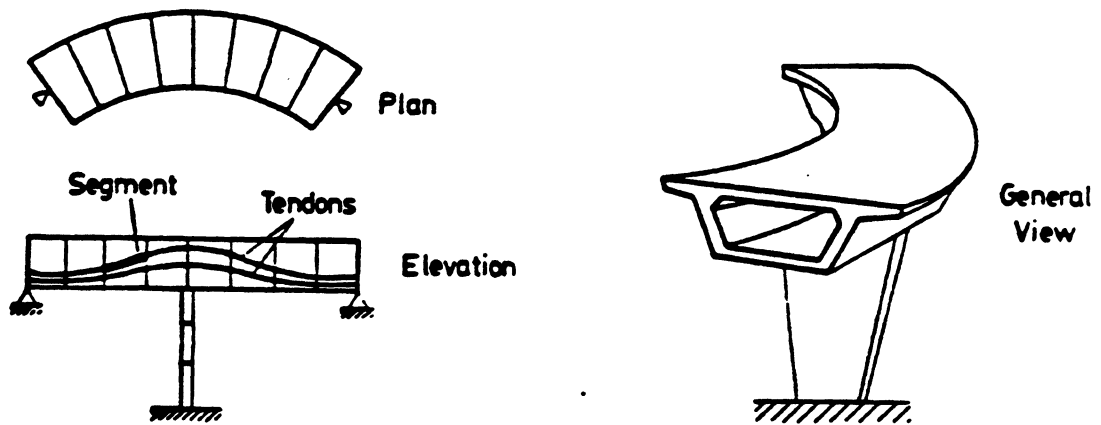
Actual and Idealized 3-D prestressed Concrete Frame.
